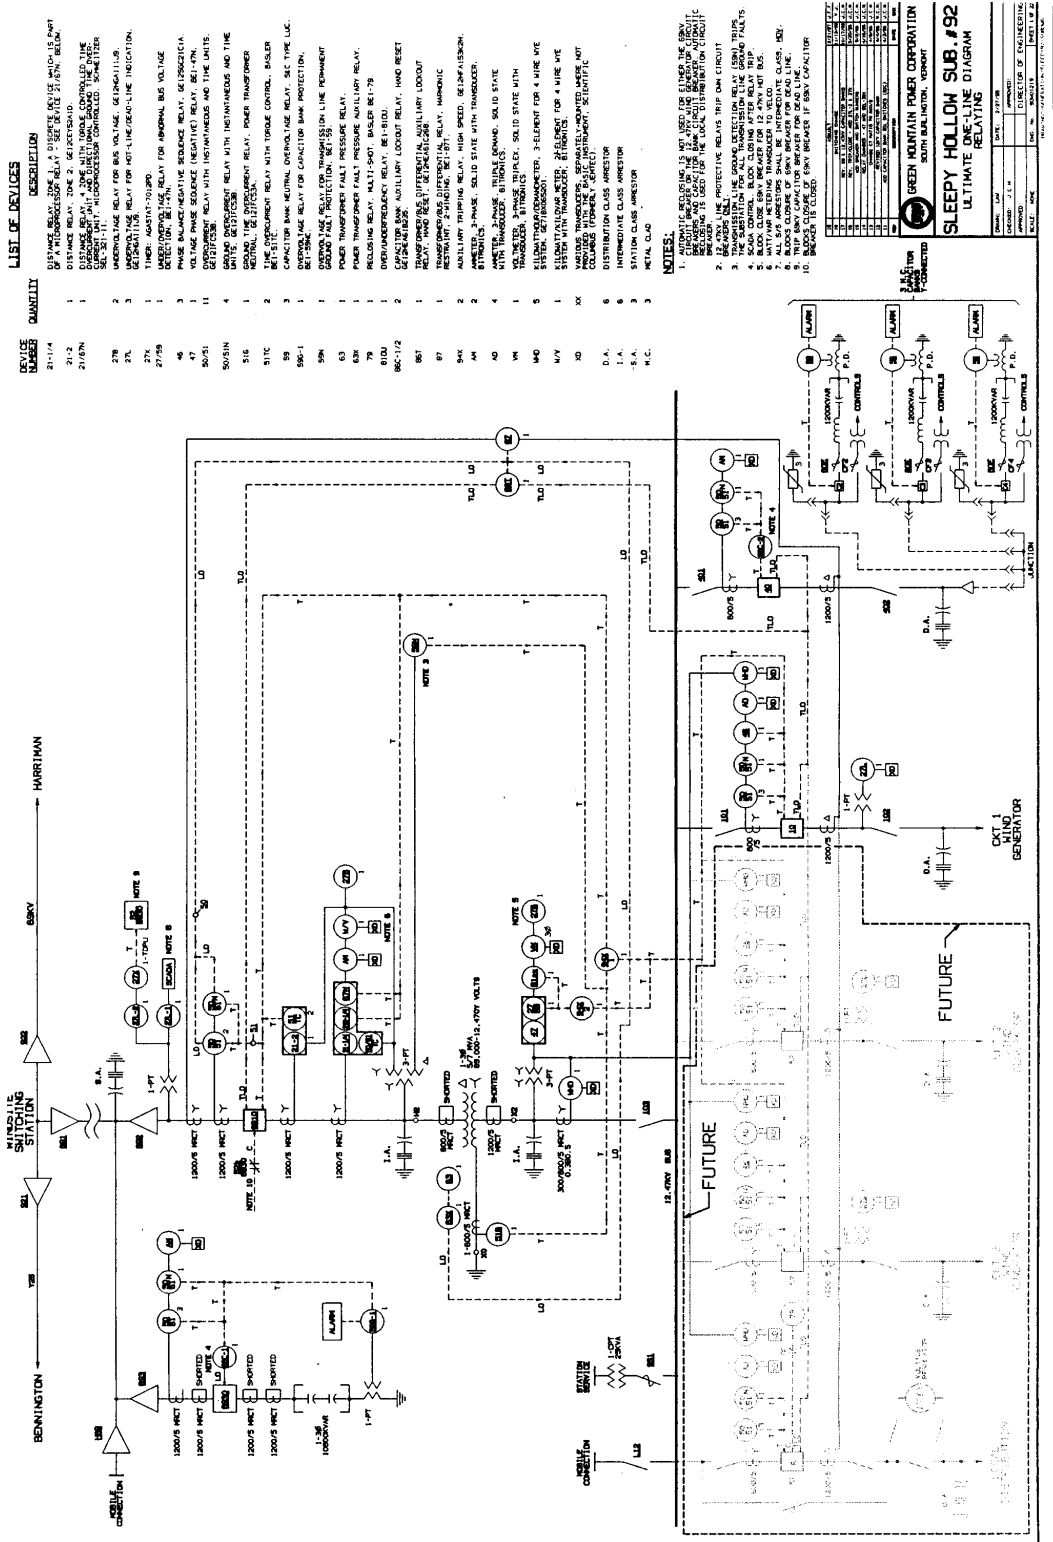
One-line Electrical Drawing for Power Collection System at GMP Project Site
